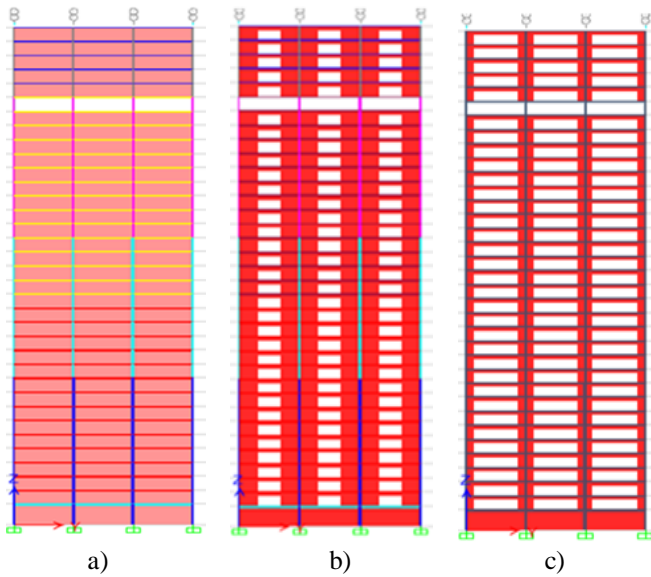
a) Elevation of M4, b) elevation of AOM4, c) elevation of BOM4.
